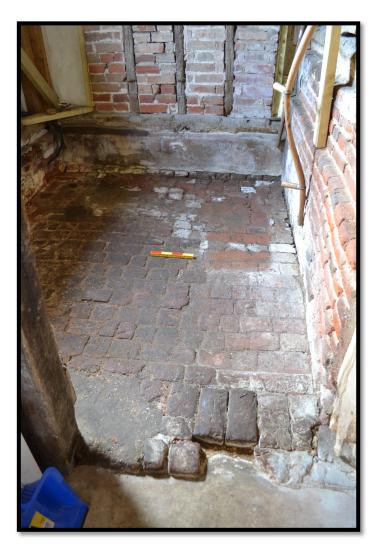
The Barn (Area 1), ground floor, facing south - Brick floor to southeast room
